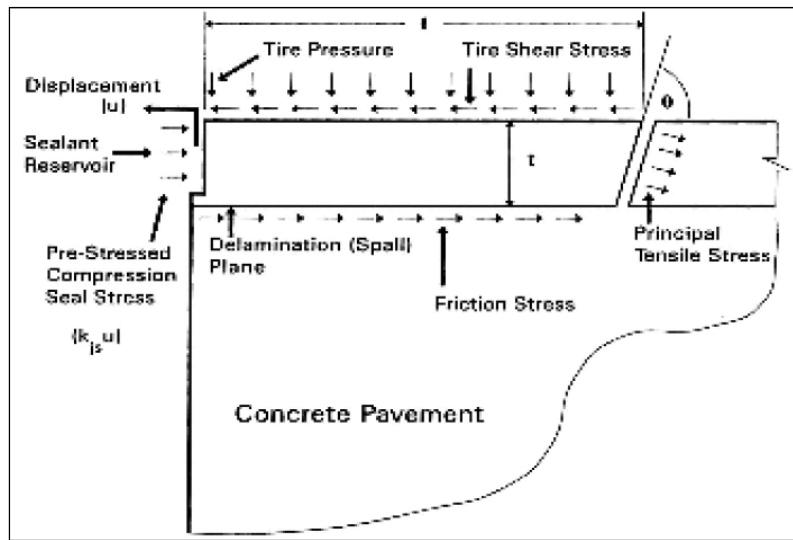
Concrete Pavement Spall Mechanism and Model. (Zollinger et al. 1994)
